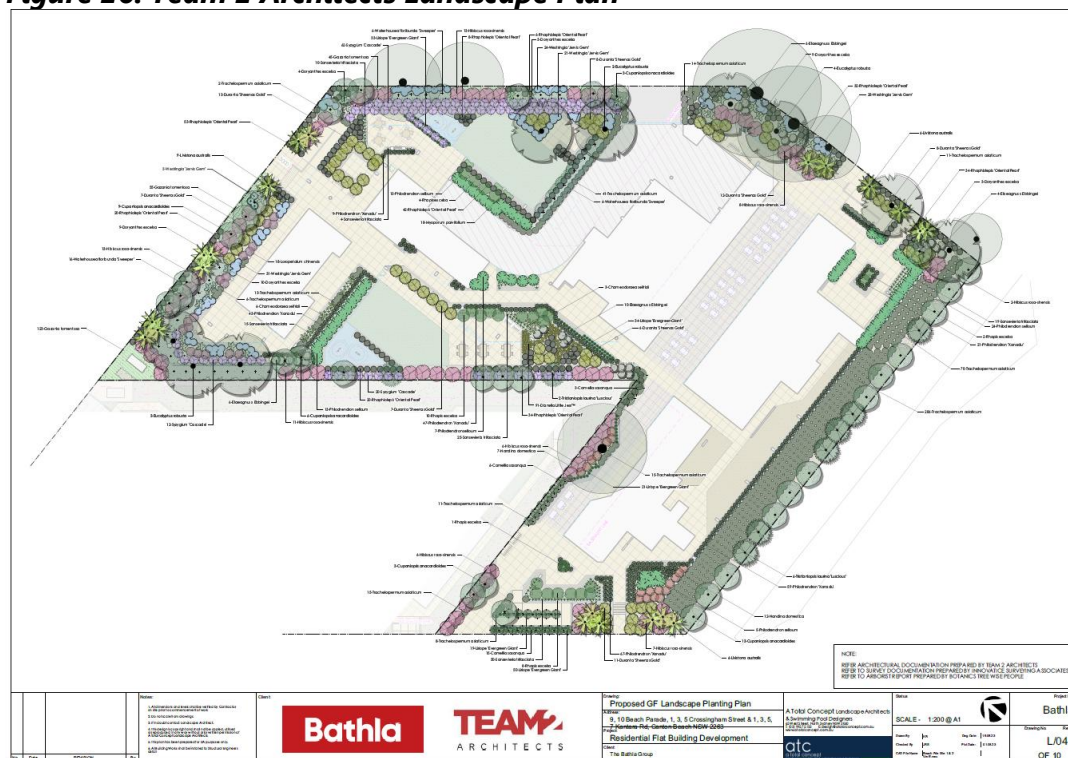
Team 2 Architects Ground Floor Landscape Plan
